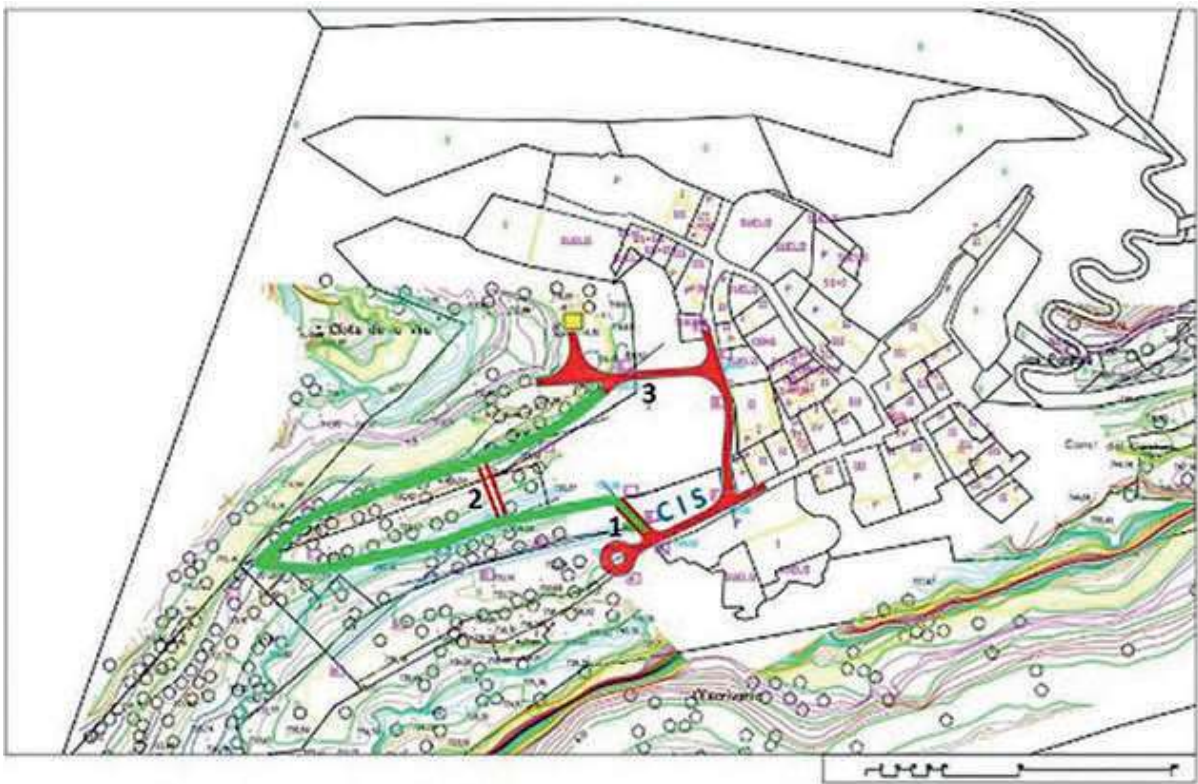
Proposed maintenance paths 1, 2 and 3 (double line) around the Treatment Plant, shown on a cadastral plan [3]. Ground site proposal for the CIS (Siurana Interpretation Center) Church (triangle). Town (circle). Castle (rectangle).
